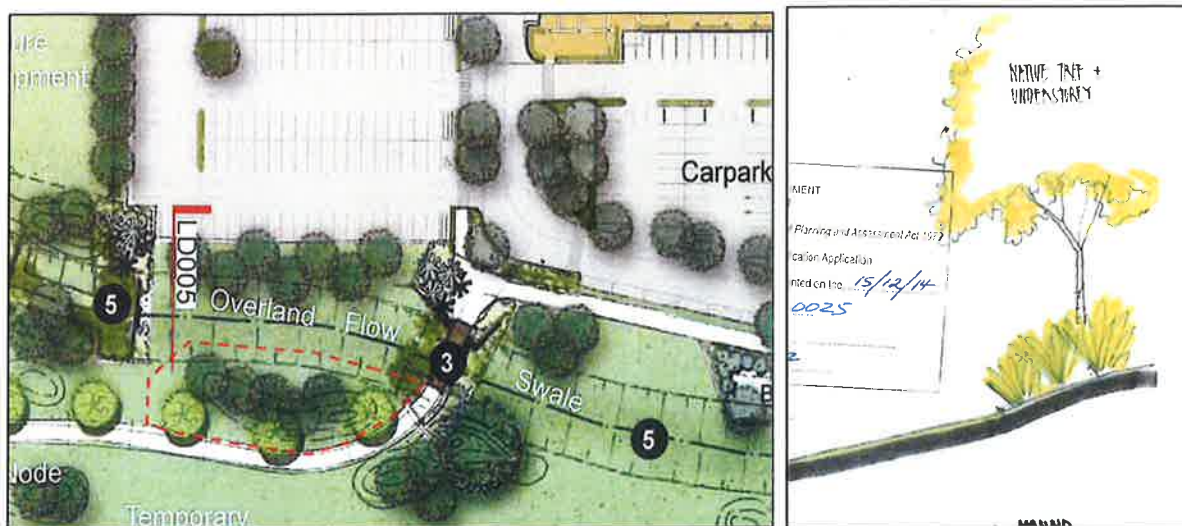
| Extract from approved landscape plan and associated section showing limited detail of proposed plantings to this section of the site. (source: Mod 6 approved plans)
